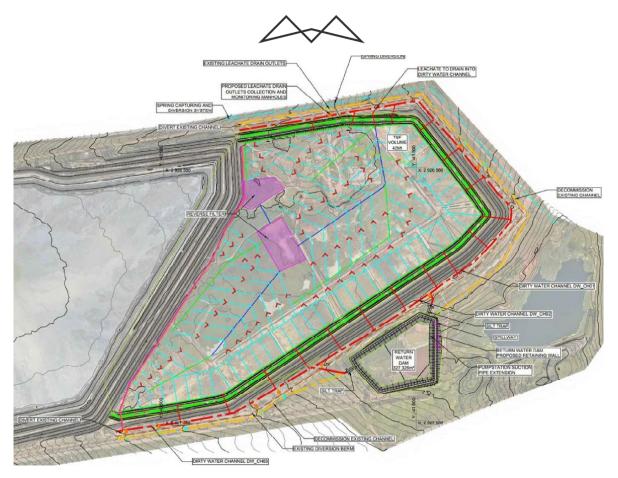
Potential stormwater and leachate collection system (Eco Elementum, 2025)
